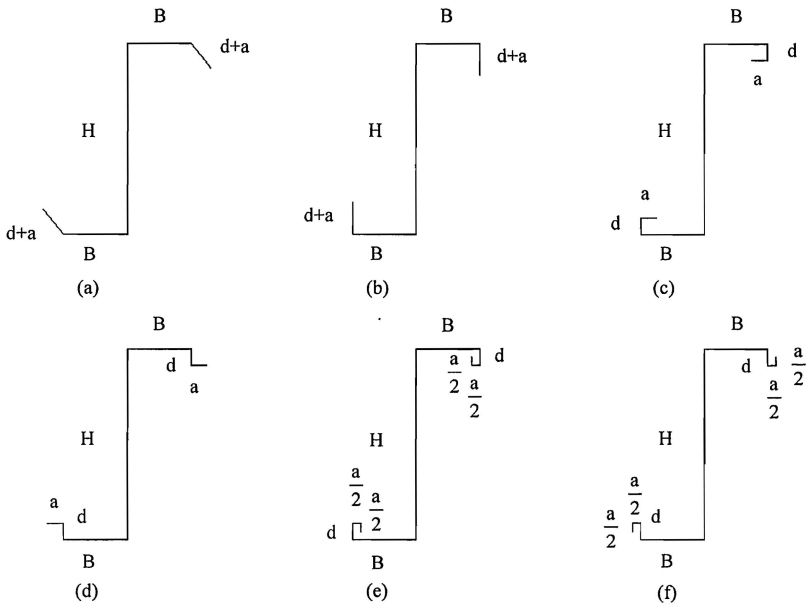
Z-section with (a) Sloping Lips Stiffener 50-degree respect to the flange (b) Simple Lips Stiffener (c) Inside Angled Stiffener (d) Outside Angled Stiffener (e) Inside Hooked Stiffener (f) Outside Hooked Stiffener
